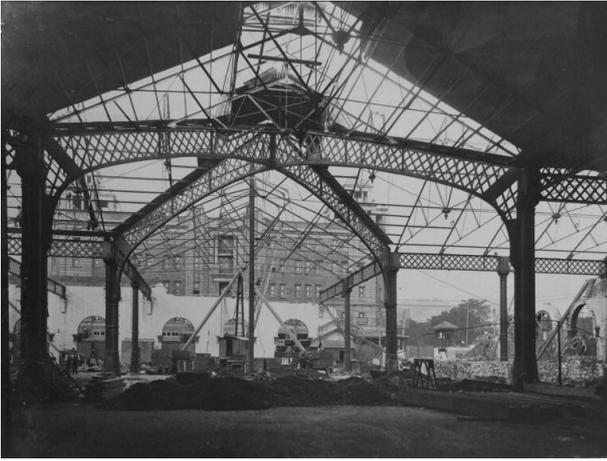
Internal view looking towards Campbell Street showing demolition of market building in progress, 2 July 1913.
